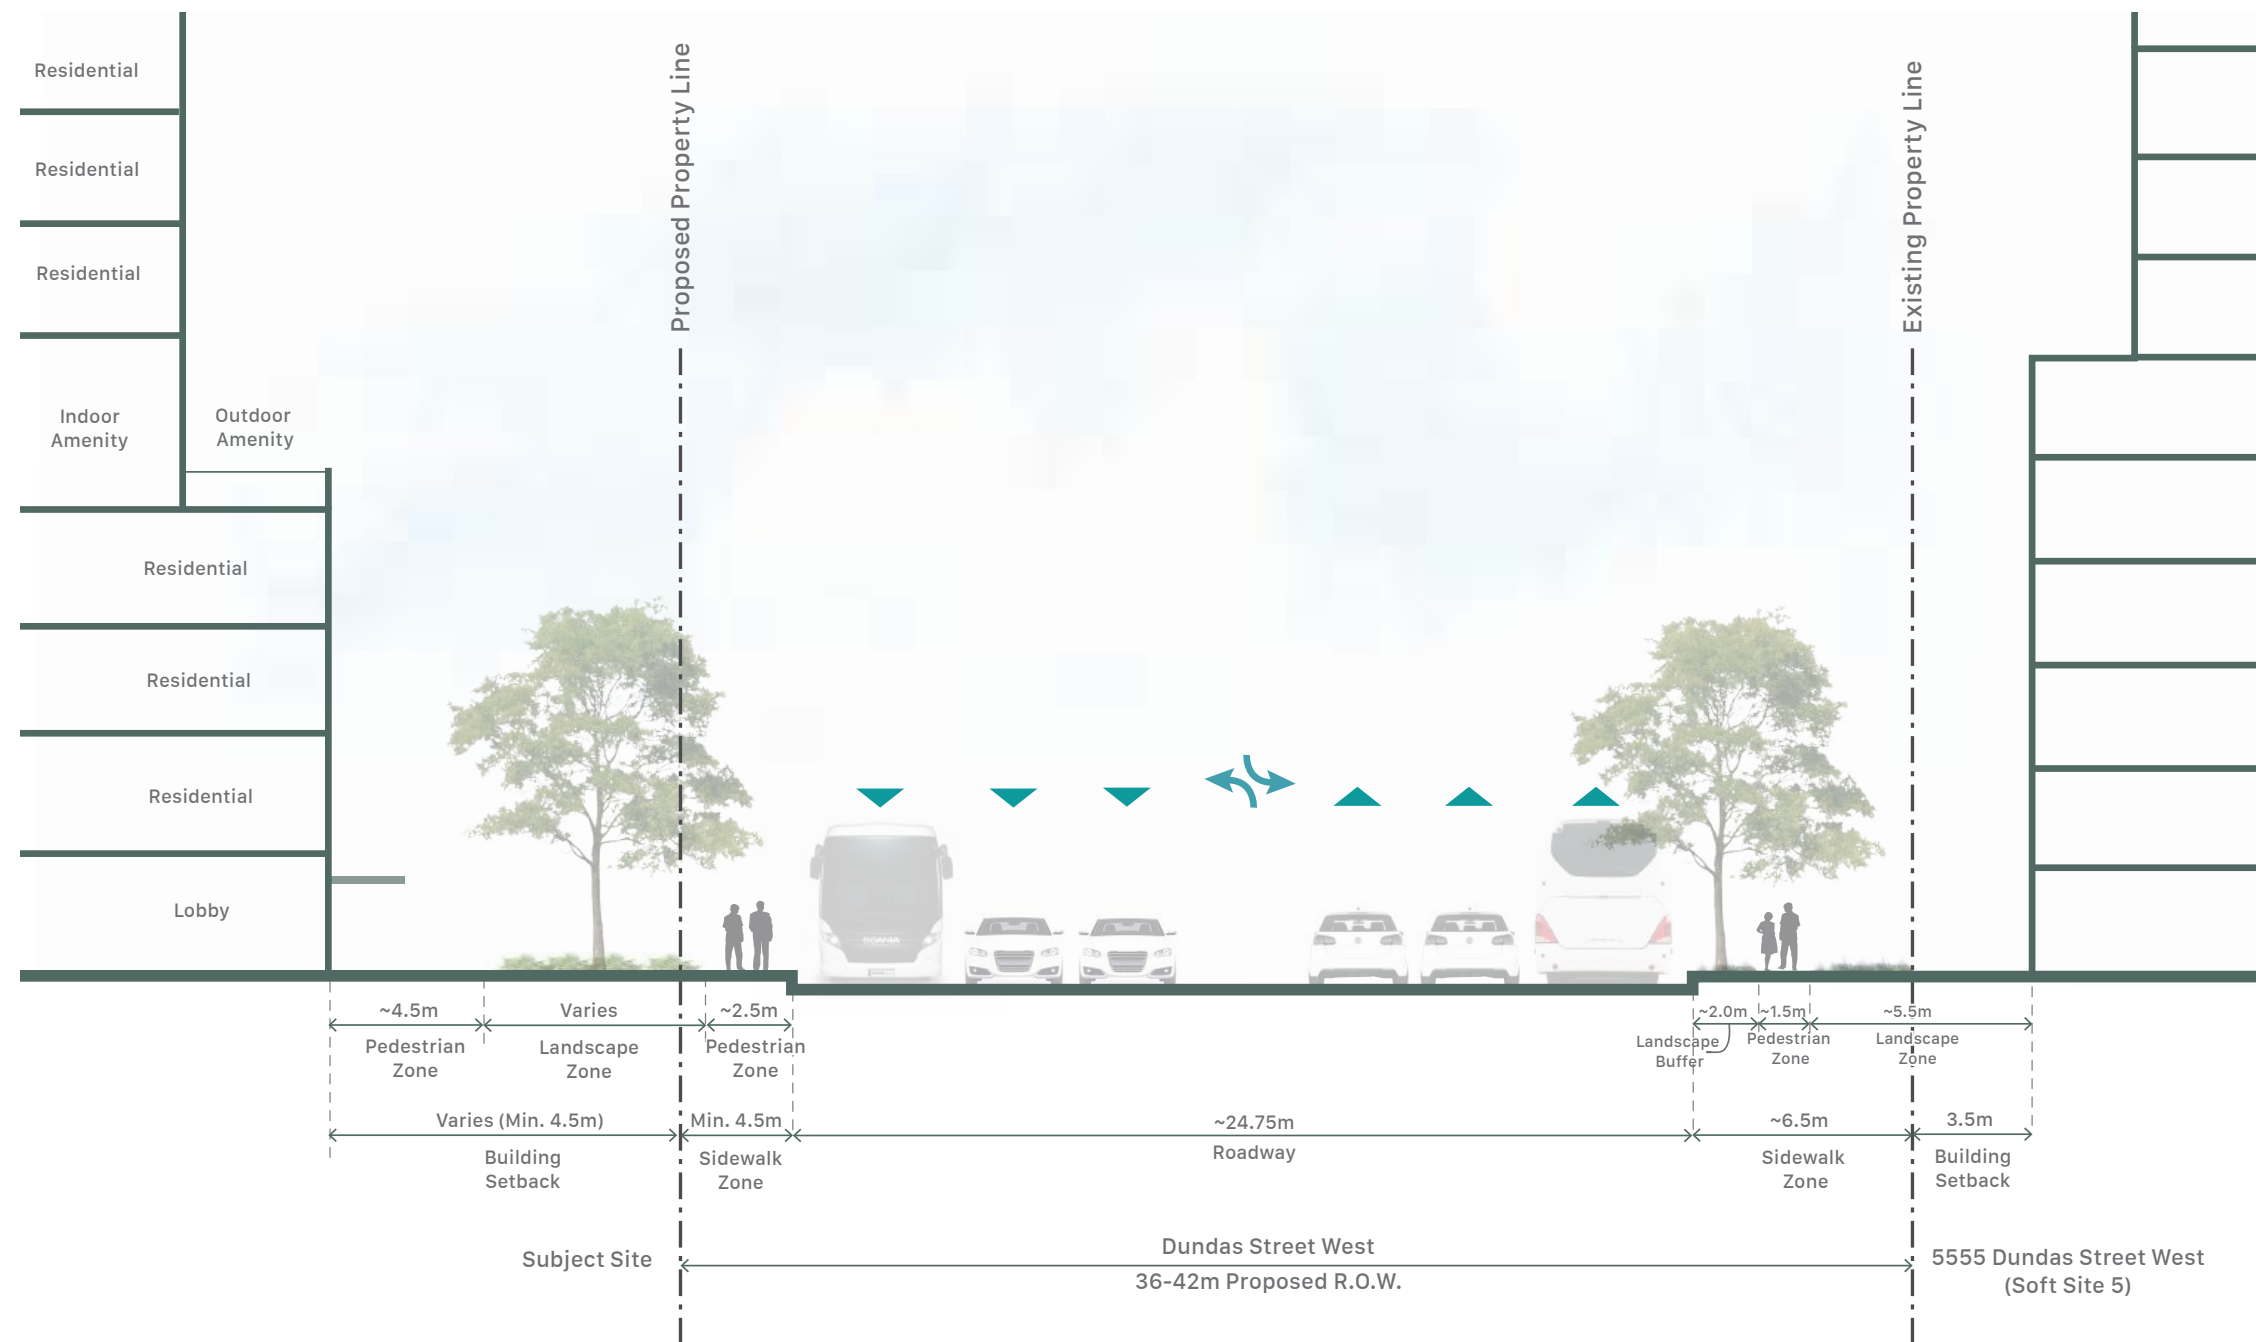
Proposed Dundas Street West Section Looking East (D-D)
